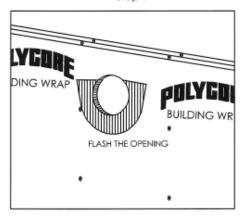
TYPICAL WINDOW FLASHING DETAIL
